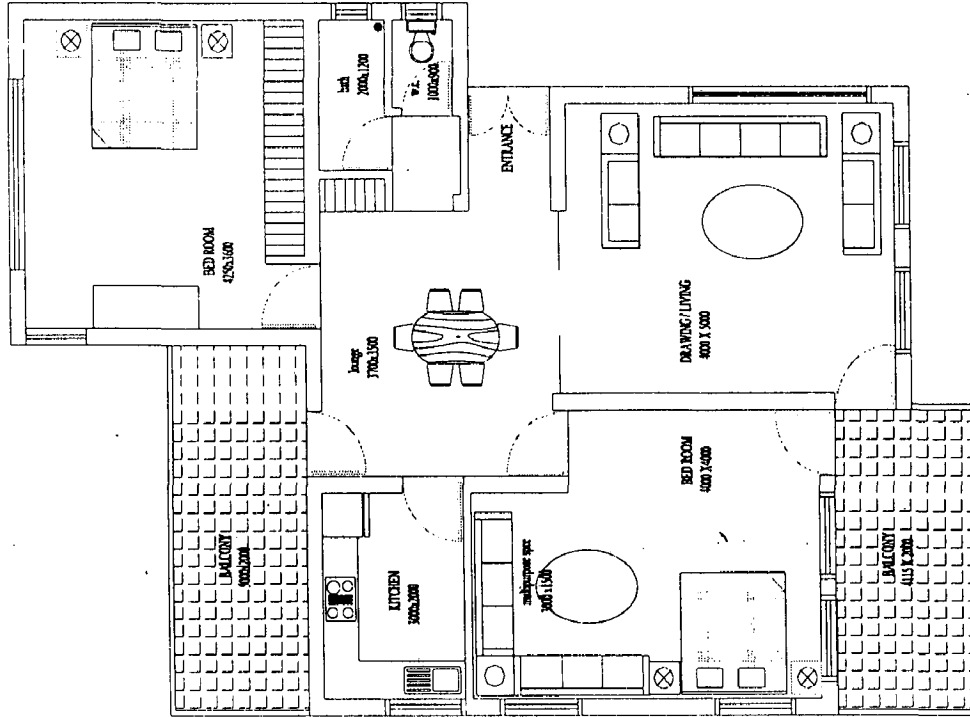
CONCEPTUAL PLAN (alternative)
